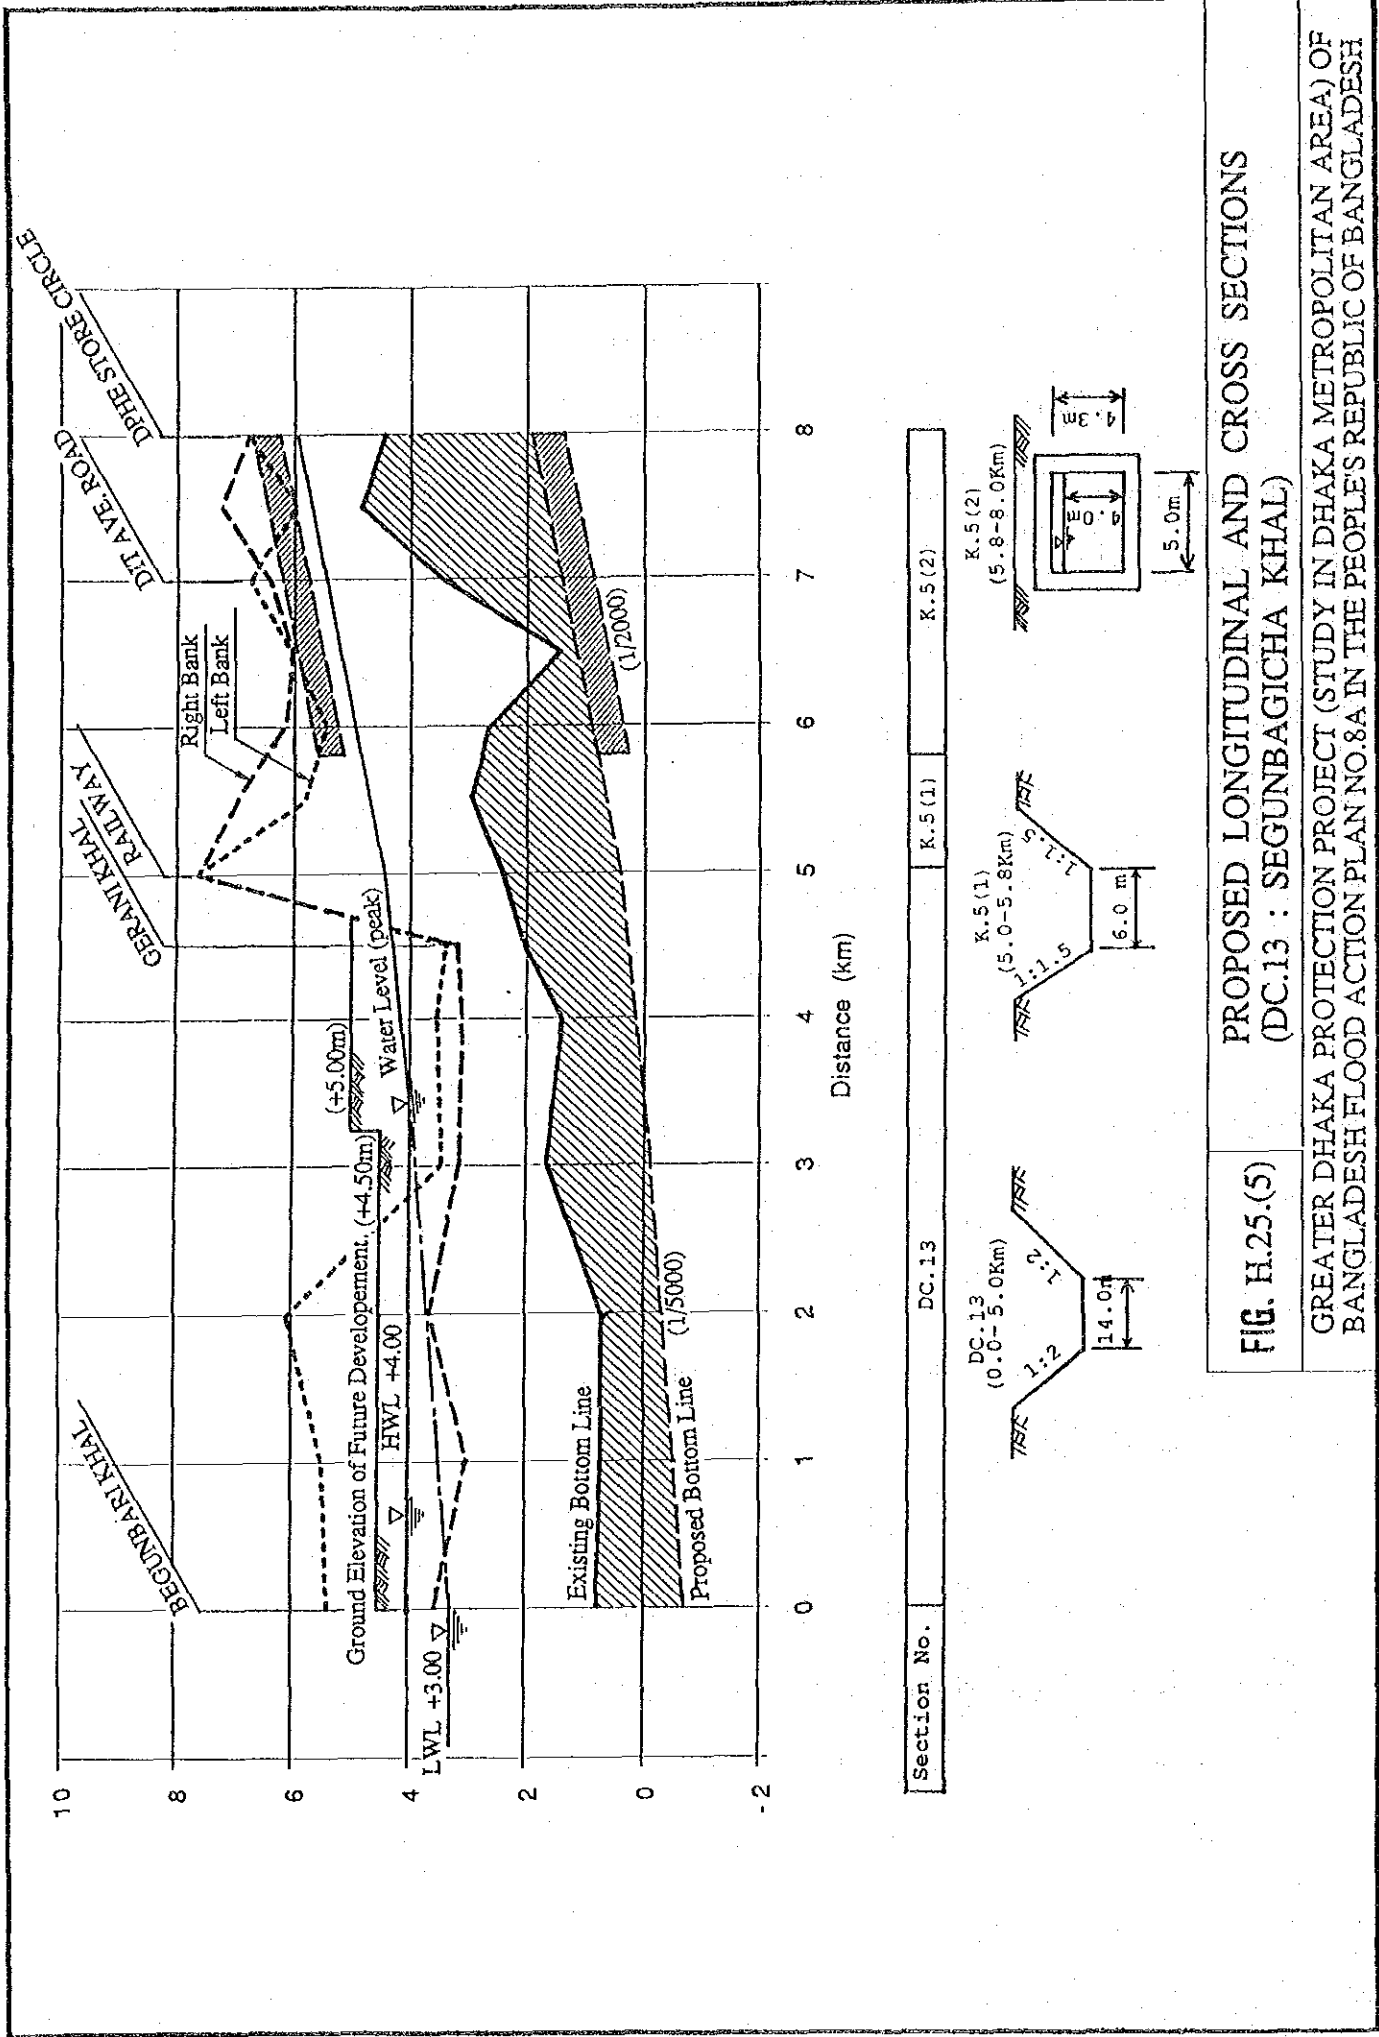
(5) PROPOSED LONGITUDINAL AND CROSS SECTIONS
